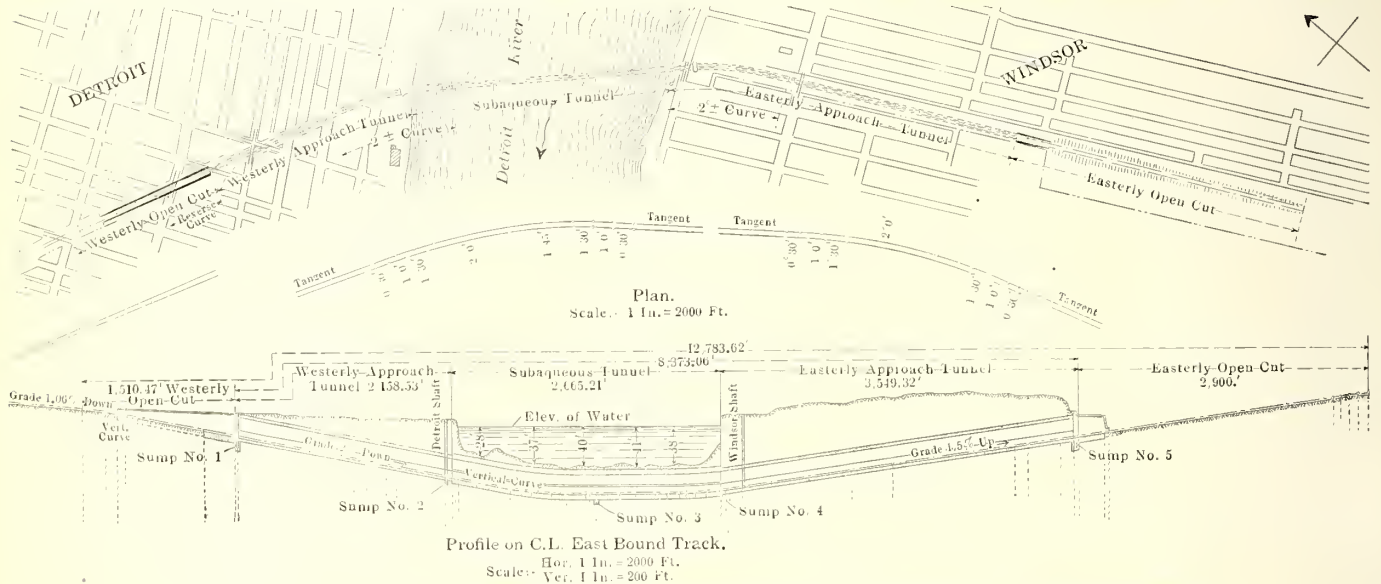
Detroit Tunnel—Plan of Tunnel and Approaches, with Profile of Eastbound Track
